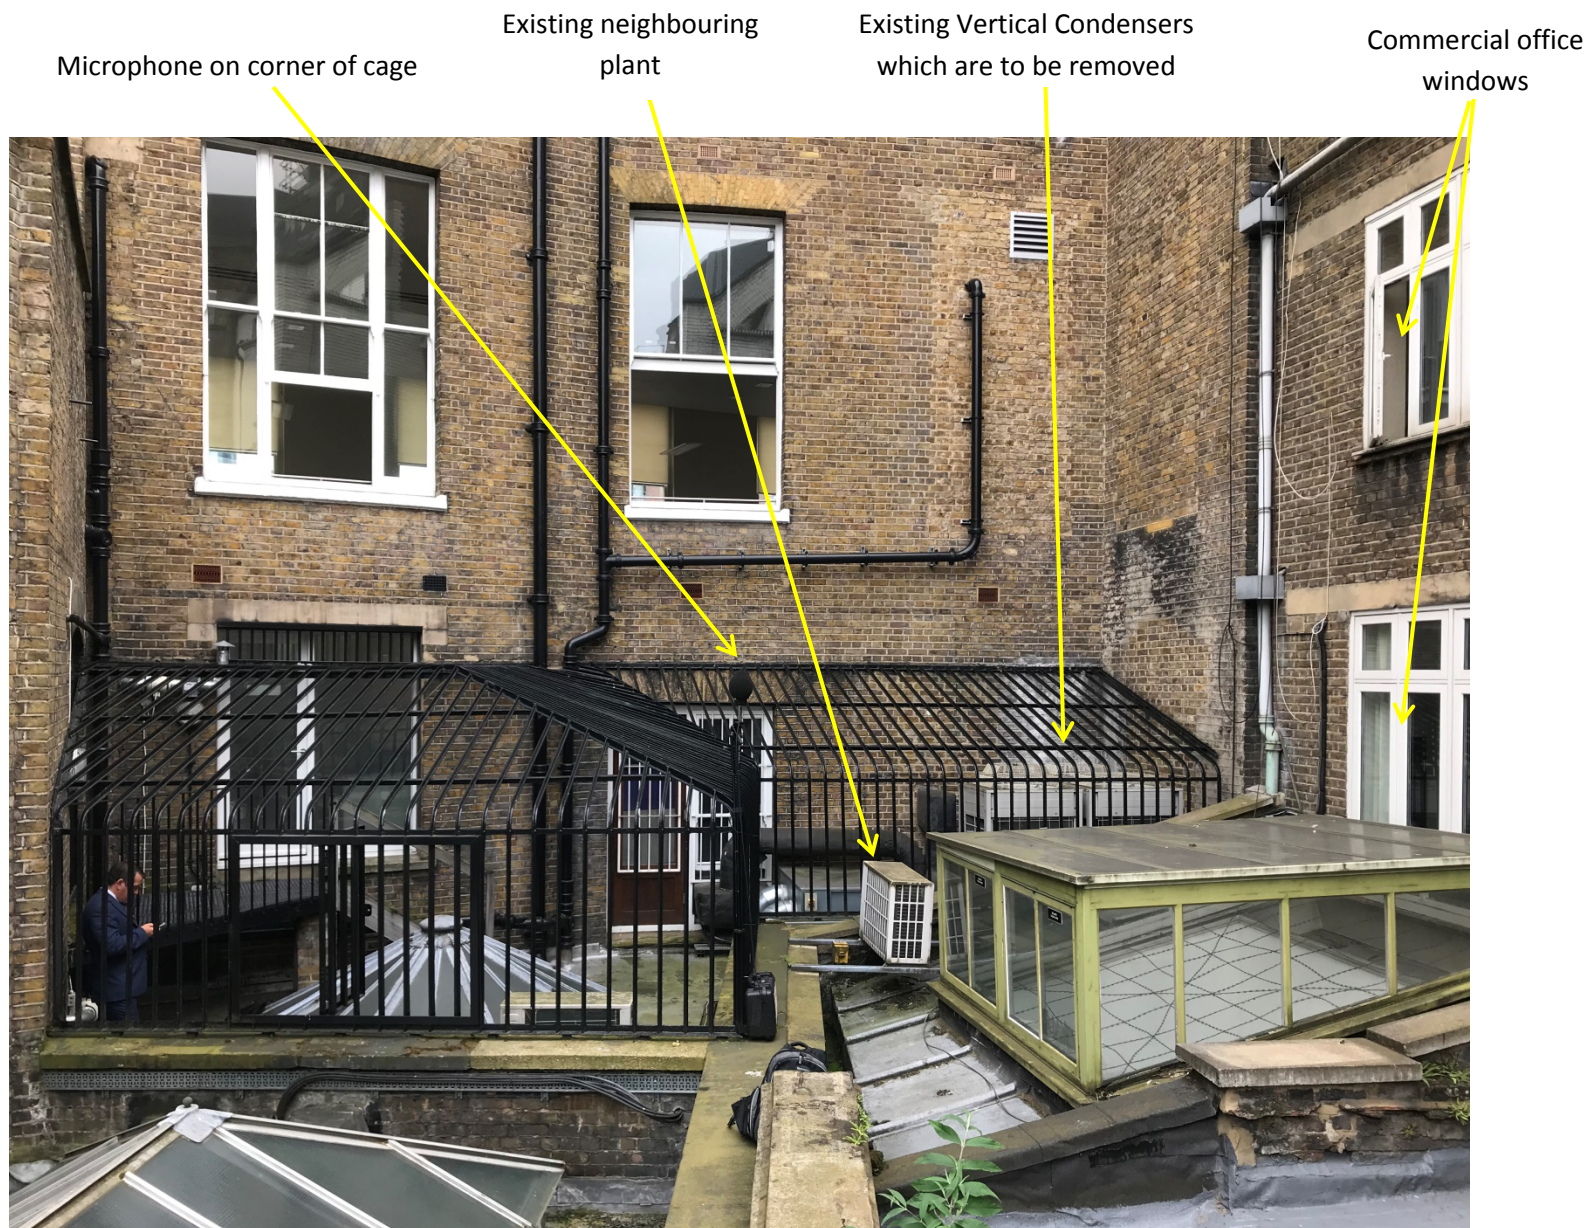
Photo C – View of rear of 1 Ely Place showing plant at low level and neighbour’s condensers
